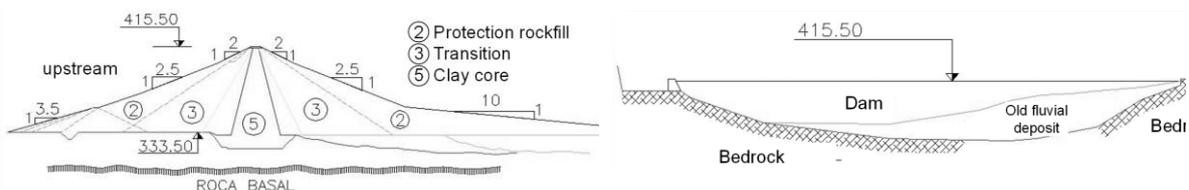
Cross section and longitudinal section of Paloma Dam
